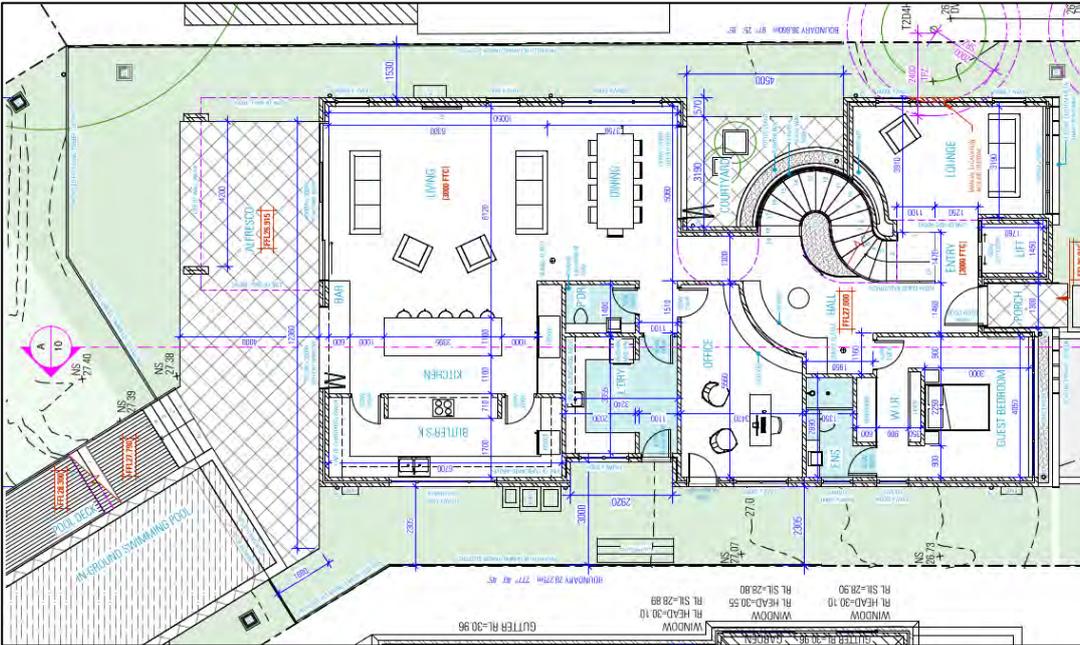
Proposed Ground Floor Level (unchanged from refusal)
